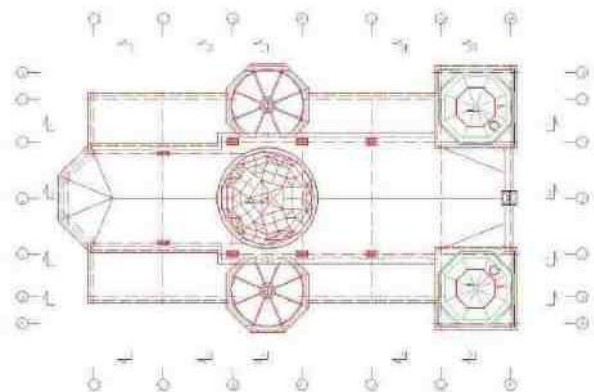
Plan – horizontal cross-section - levels +2.70/ + 3.66m.
